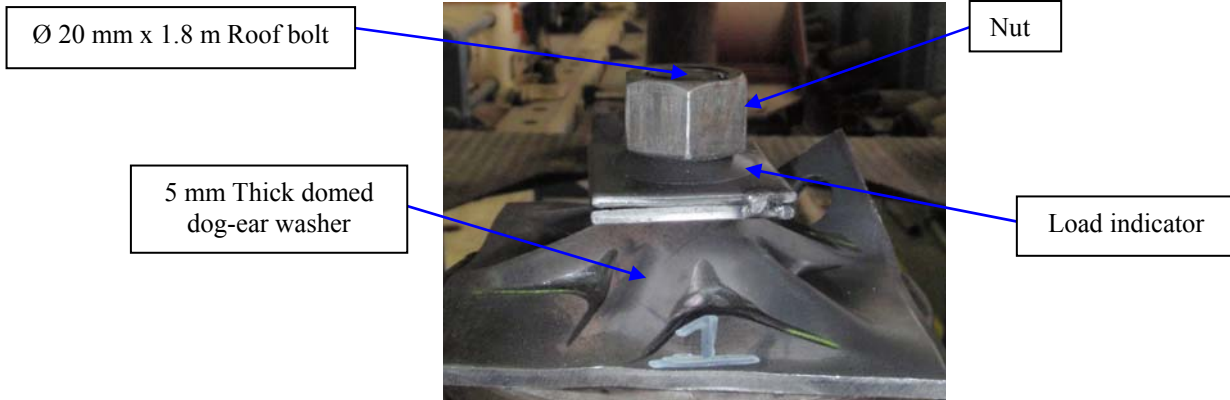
Y20 x 1.8 m Long Roof bolt assembly installed in the testing machine.
